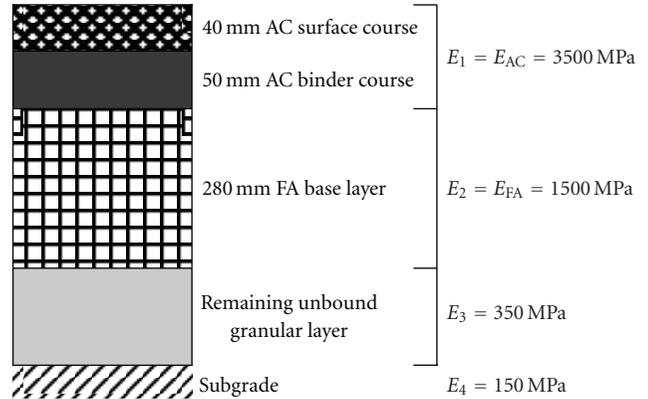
Pavement design cross-section of the in-depth recycled pavement.
